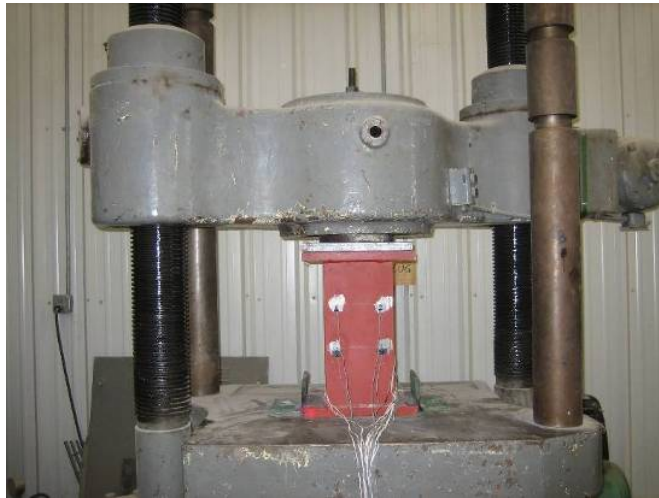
Compression component test setup using a Baldwin 400 kip capacity machine with spreader plate on top of steel pedestal
